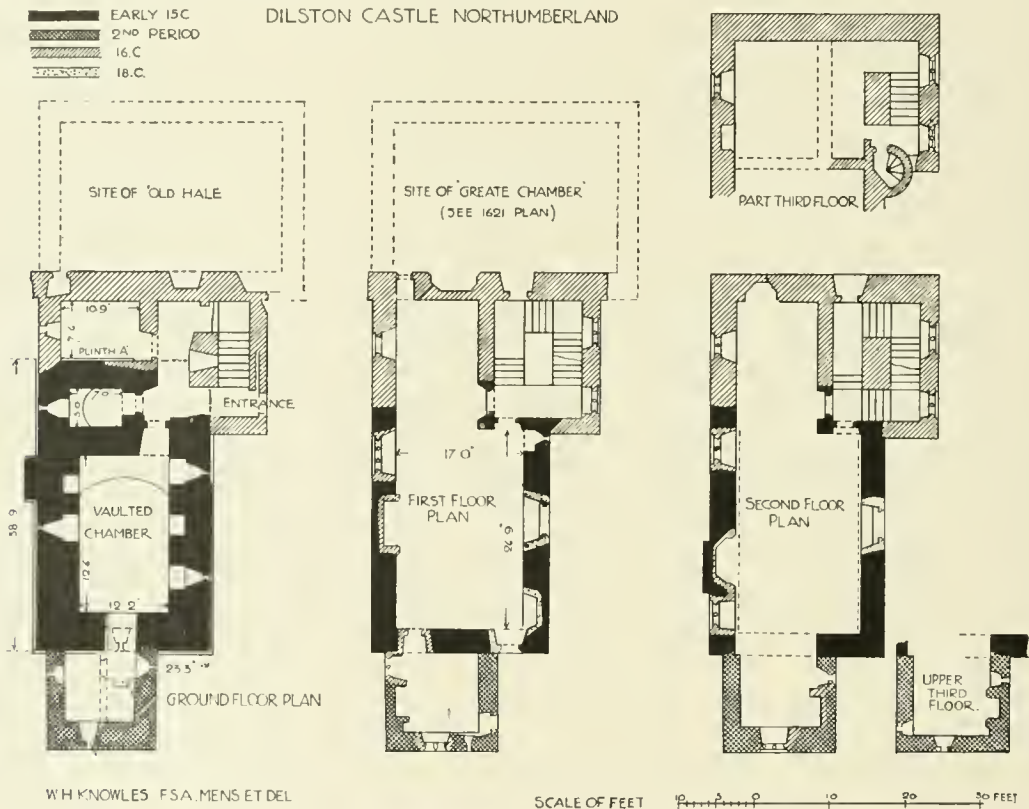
DILSTON TOWER. PLAN OF EXISTING REMAINS.
